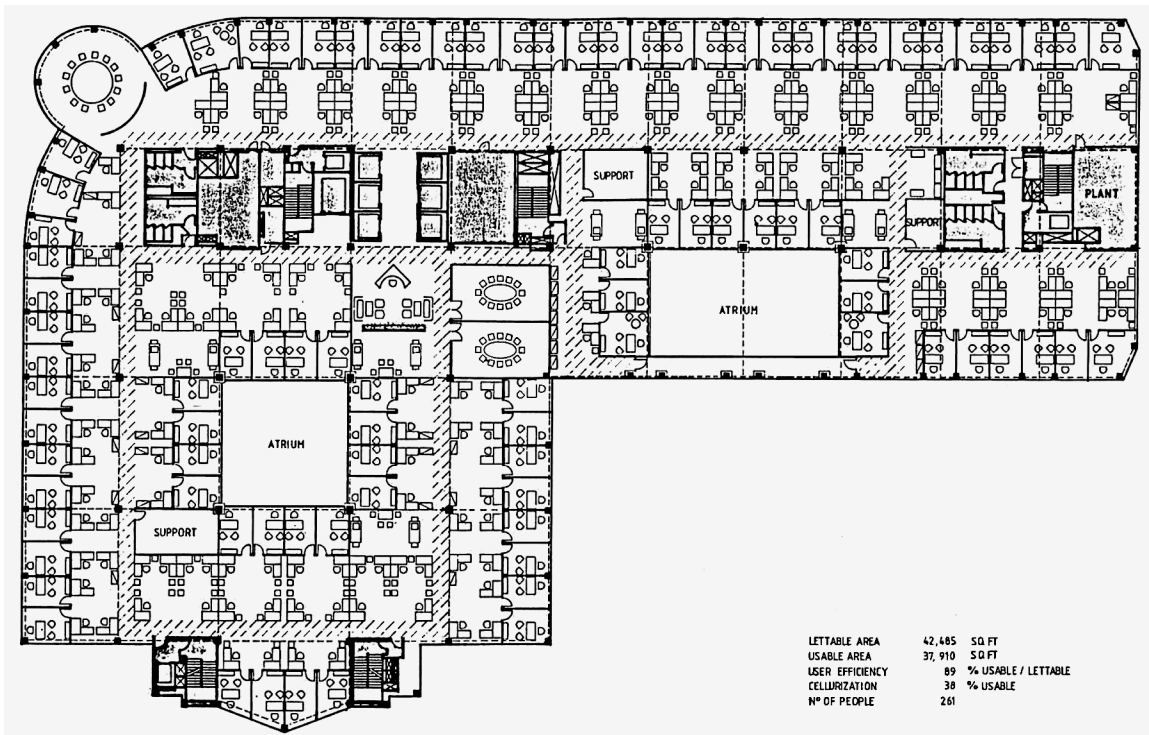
Floor plan of dealing room in Broadgate designed by DEGW, 1988.
